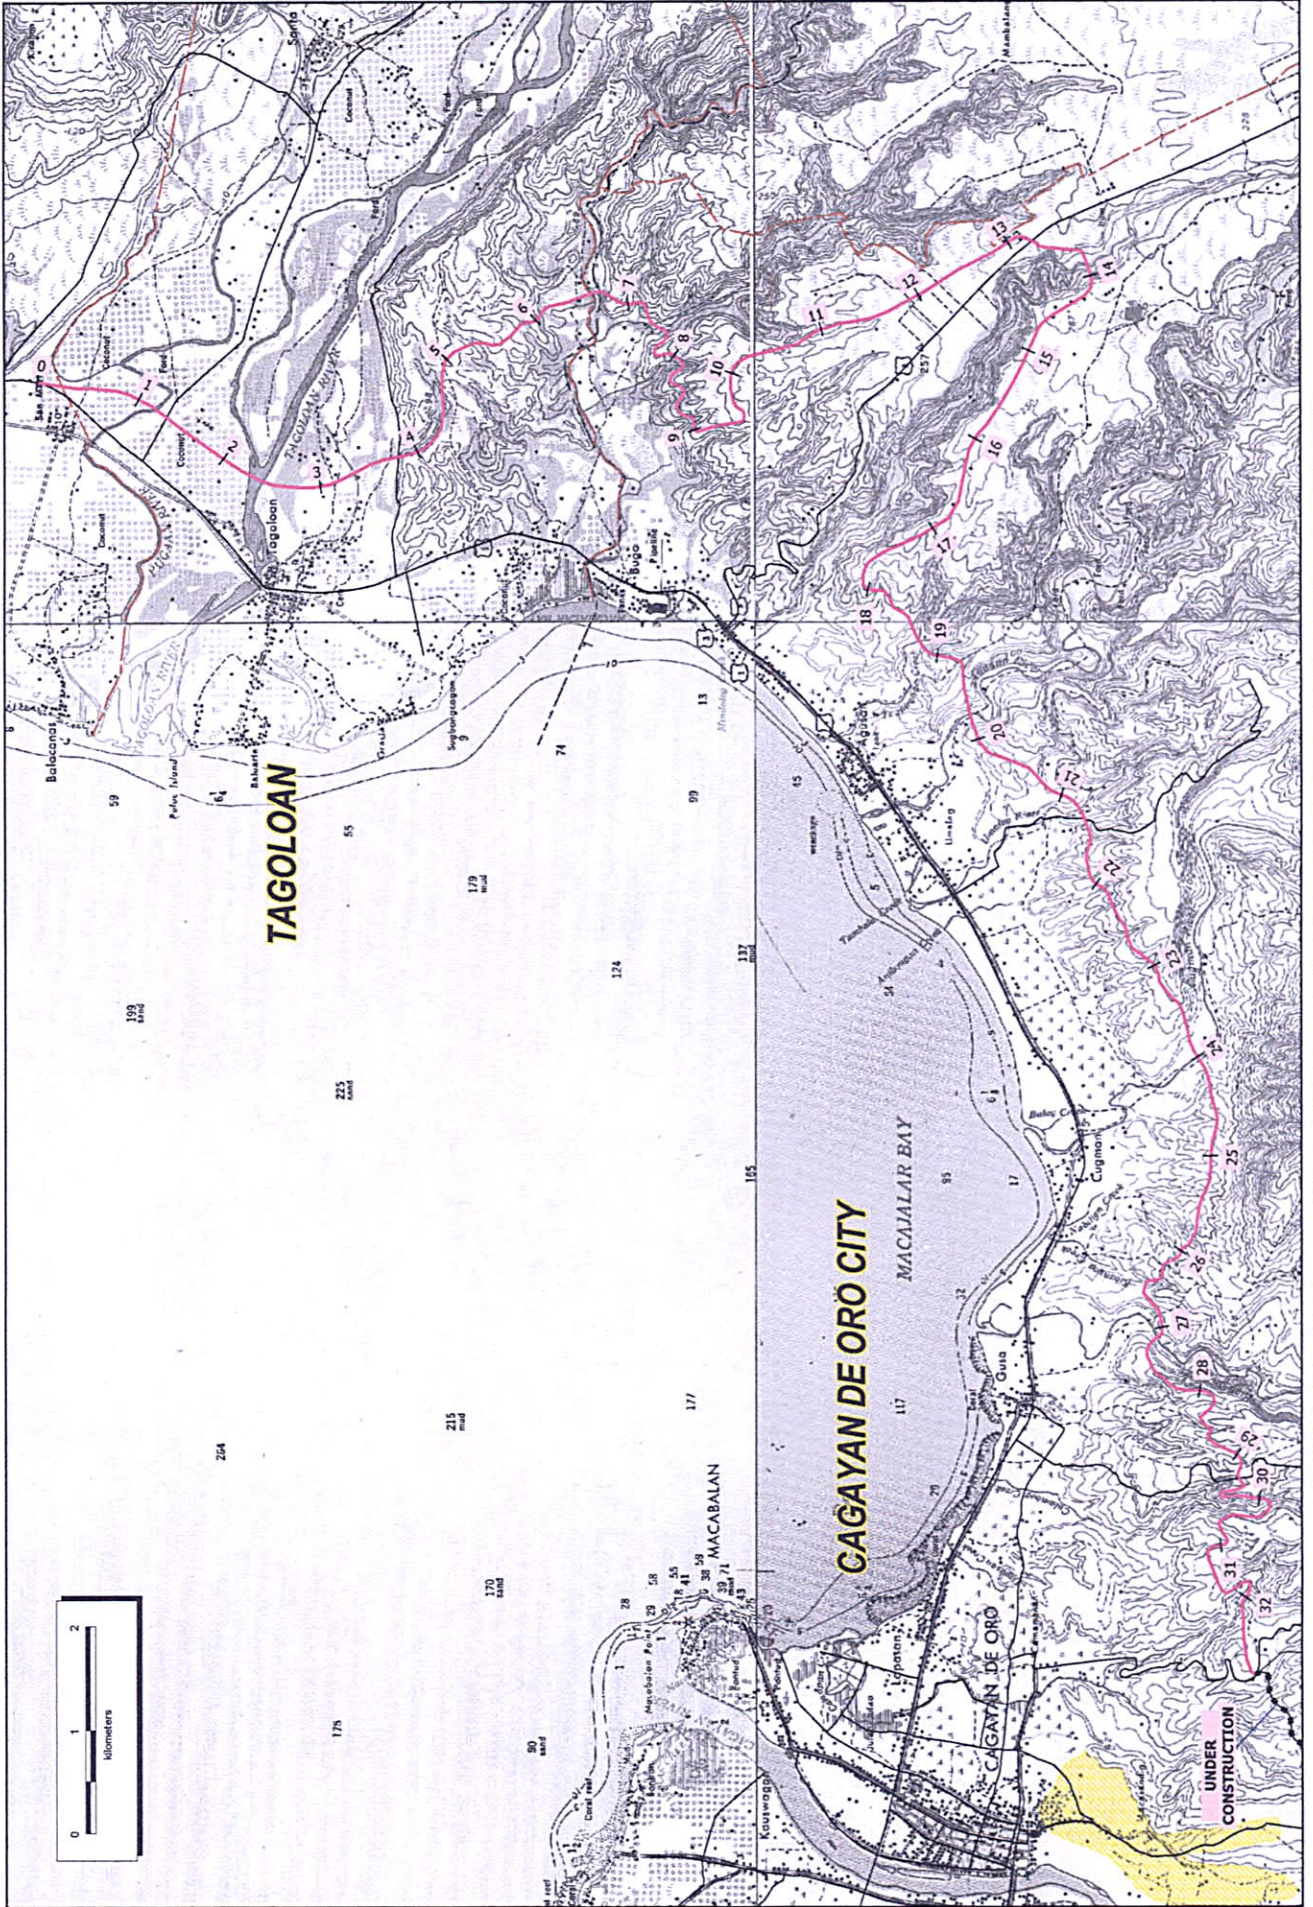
(1/2) CONSTRUCTION OF A BYPASS ROAD AT PLATEAU AREA : ALIGNMENT
